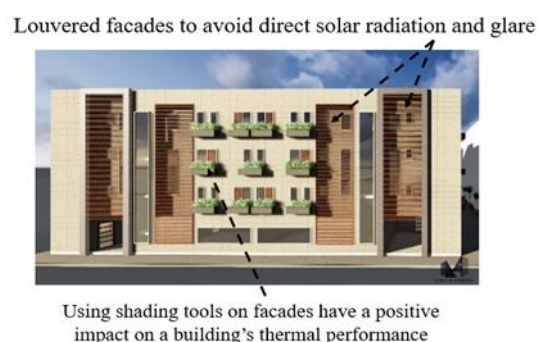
Elevation of the apartment building. (Source: analysis by the Authors)
